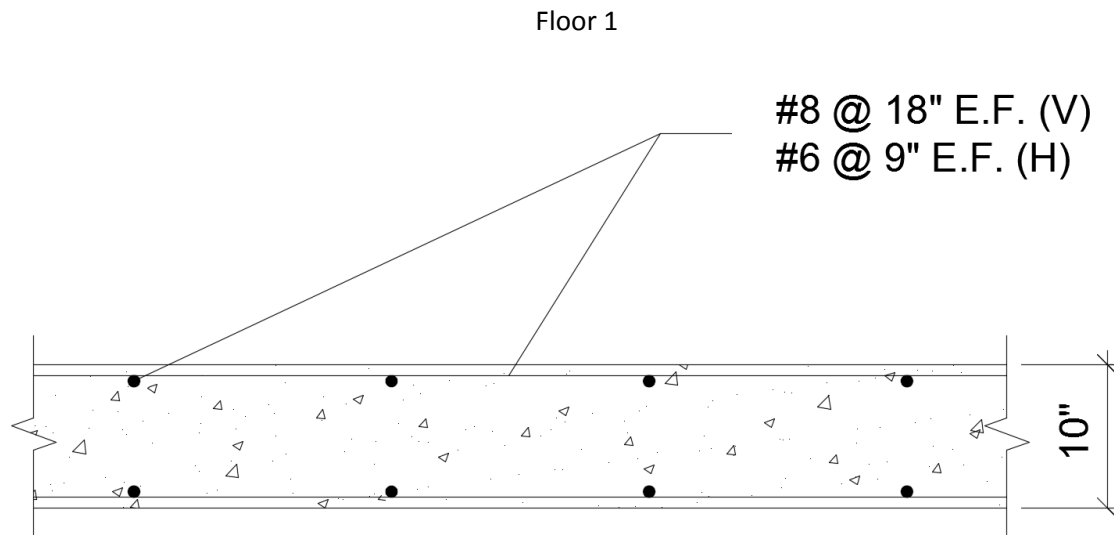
Segment of exterior wall cross-section at the ground floor level based on SDC D design.
